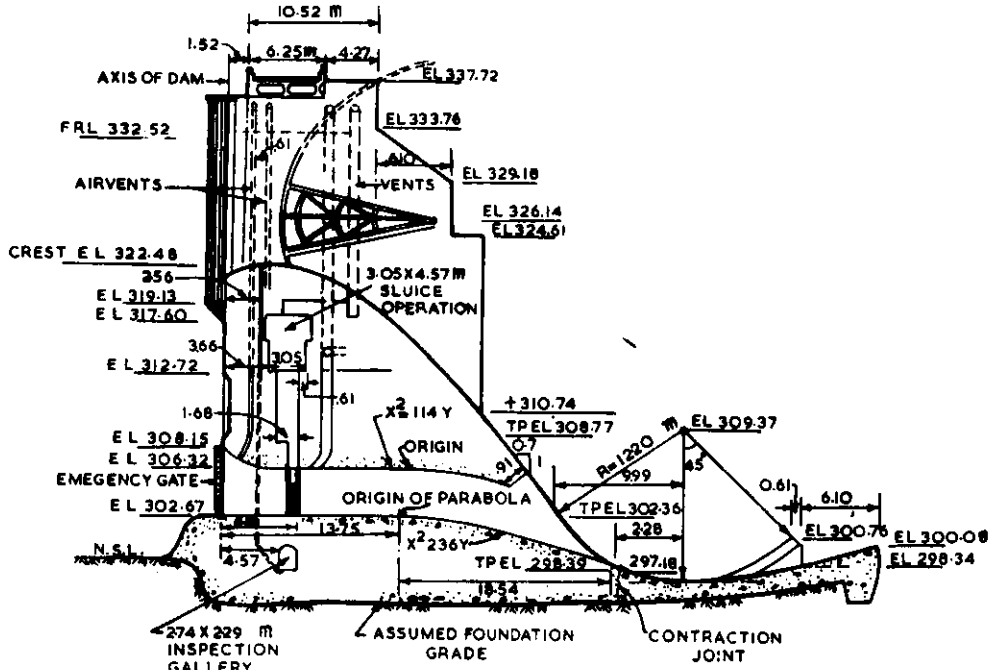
Highest overflow monolith of Pochampad masonry dam
